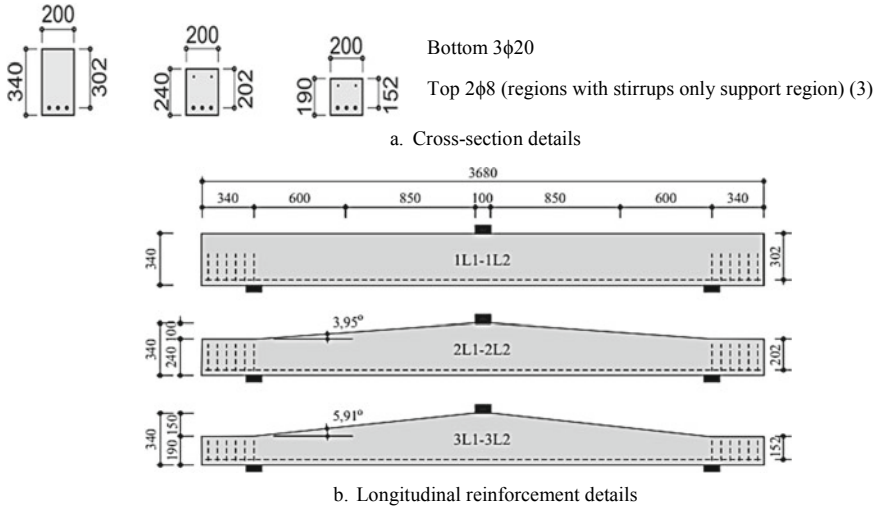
Geometry of beams with reinforcement details [5, 6]
